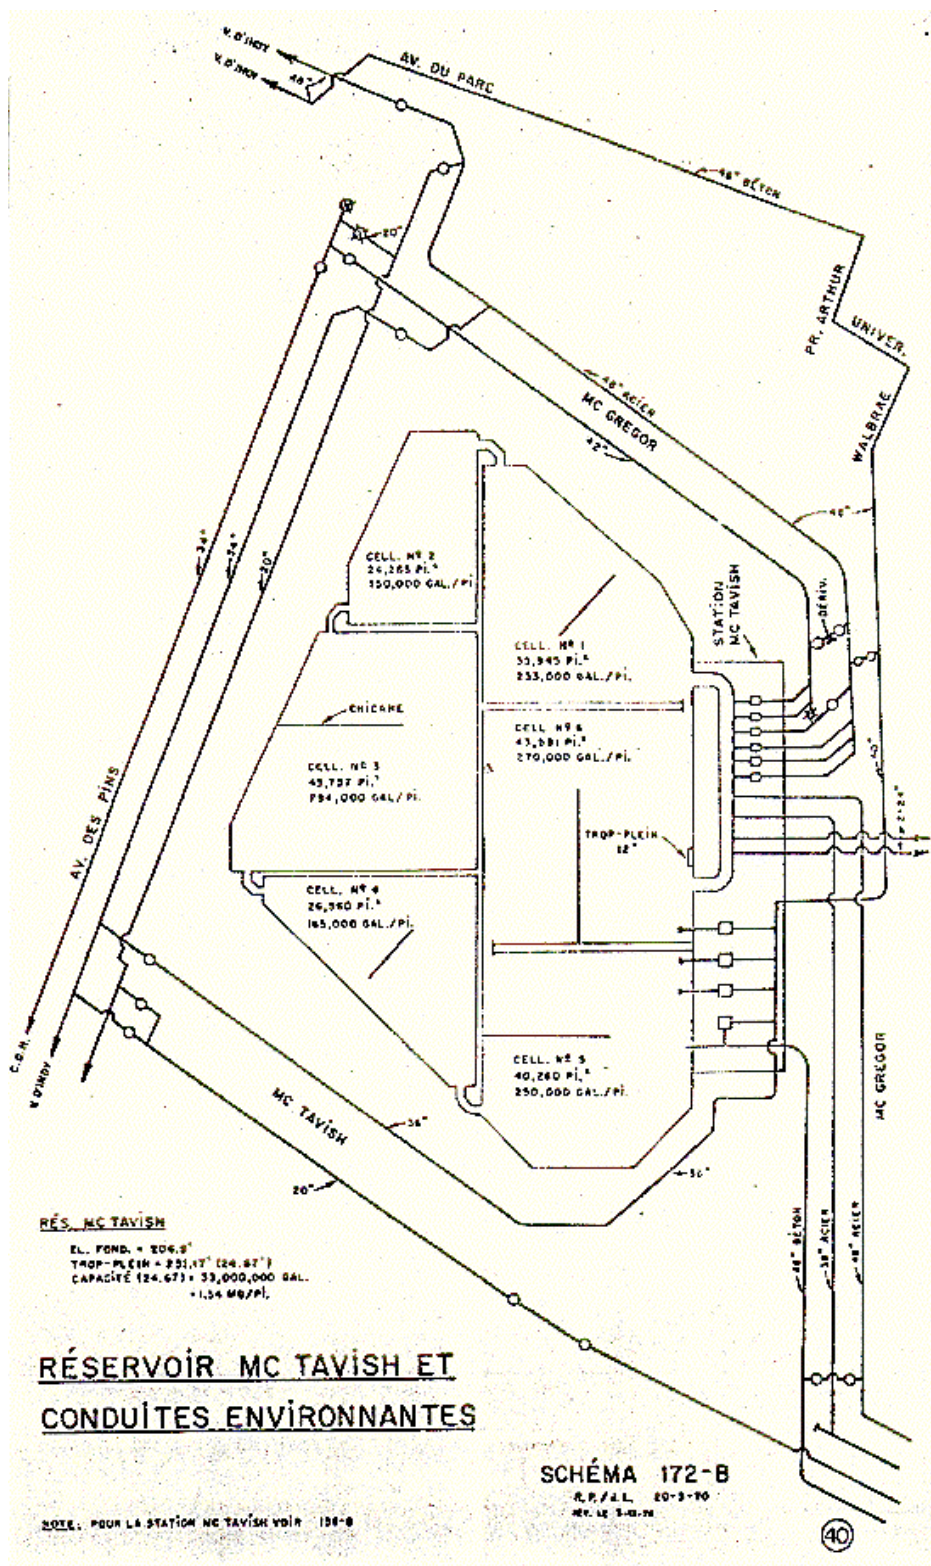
Plan of McTavish reservoir and conduits, 1970
